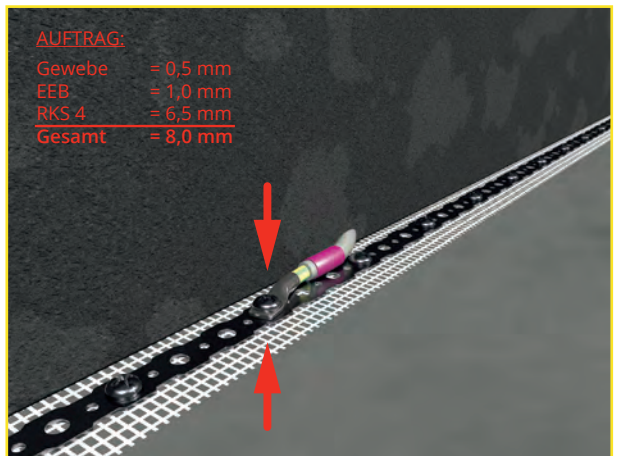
Grounding of the fabric on the floor, connection of the tubular cable lug RKS and ground strap EEB - floor
